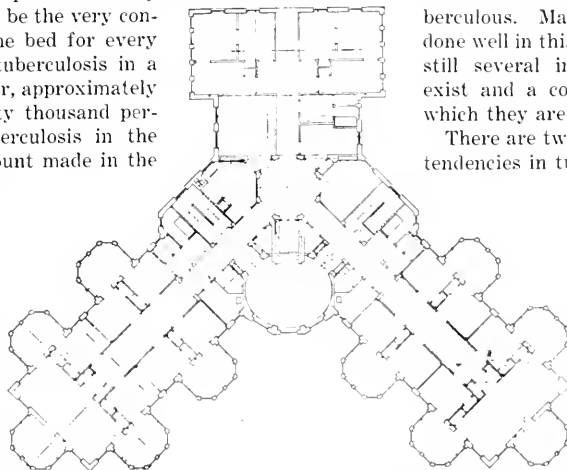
Second floor plan of the infirmary of the Nassau County Sanatorium, Long Island, N. Y.
